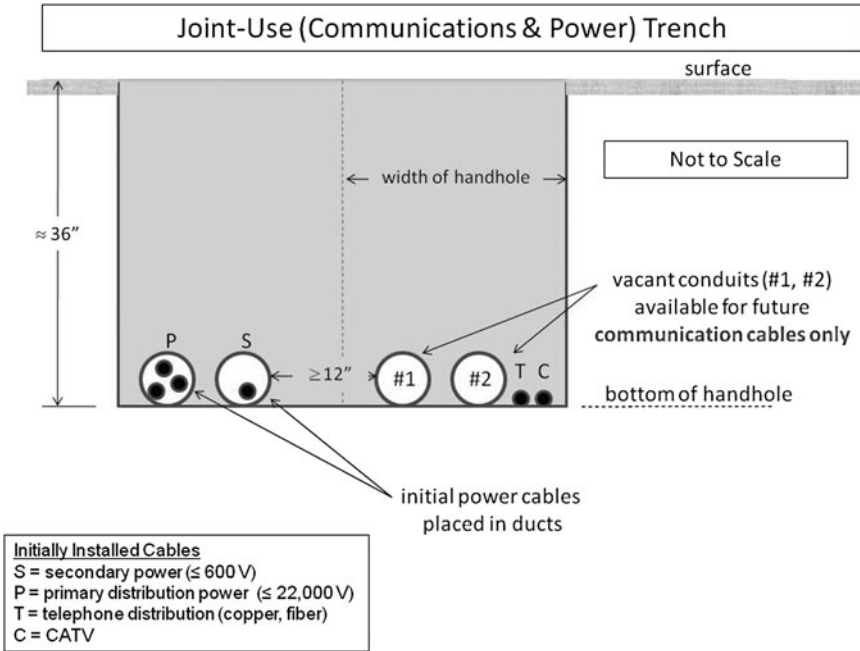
Joint-Use Trench, Including the Example BCN for Communication Only: a Shallower, Wider Trench Alternative (Trench Backfill Details Not Shown; see Section 3.2.2.1).
